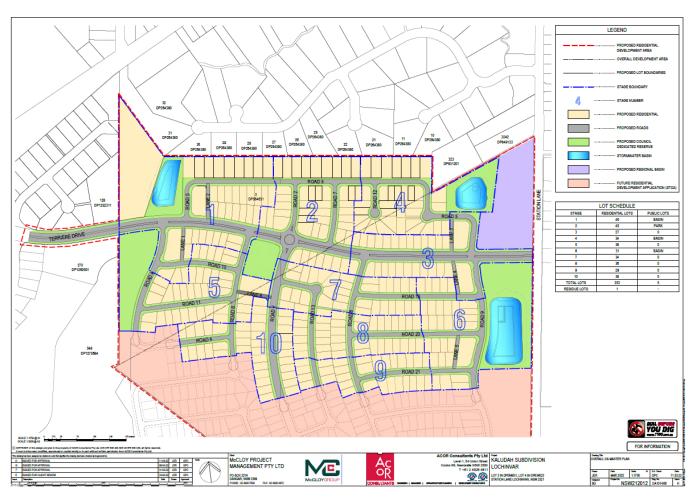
Plan of Proposed Subdivision - Stages 1 to 10
